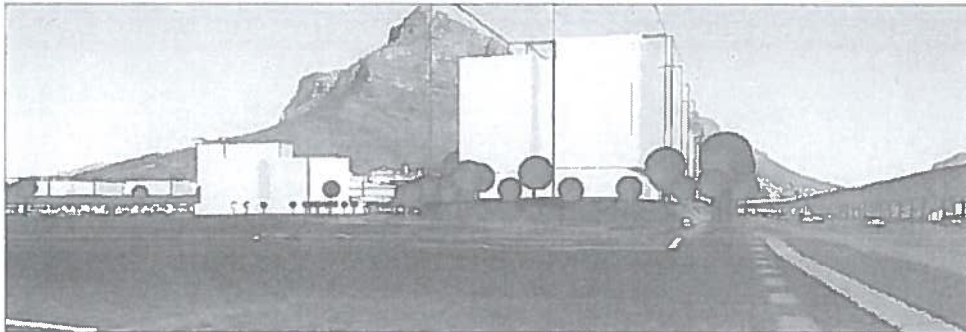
Viewpoint 2 – photomontage from top of Berkley Road extension looking westwards (Source: SRK)
